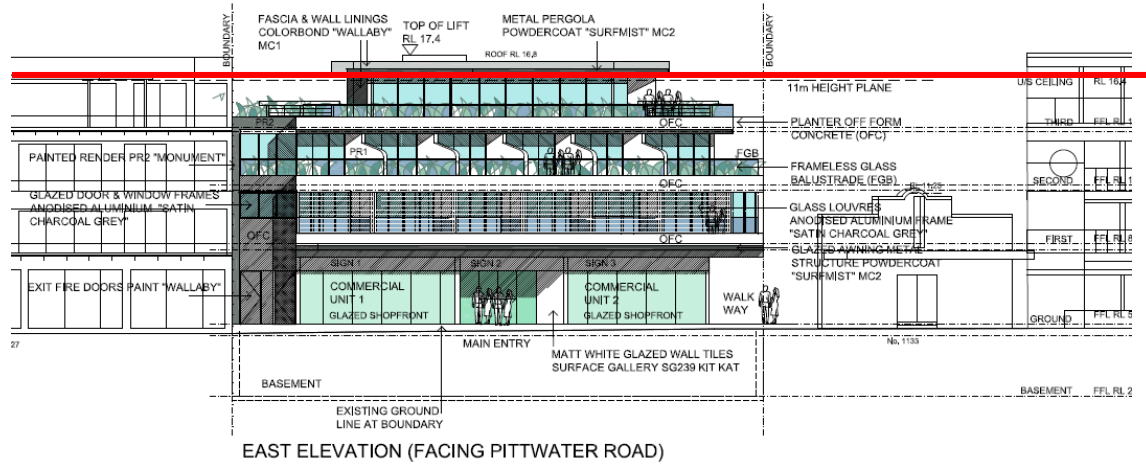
Plan (east elevation) extract showing extent of 11 metre building height breach
